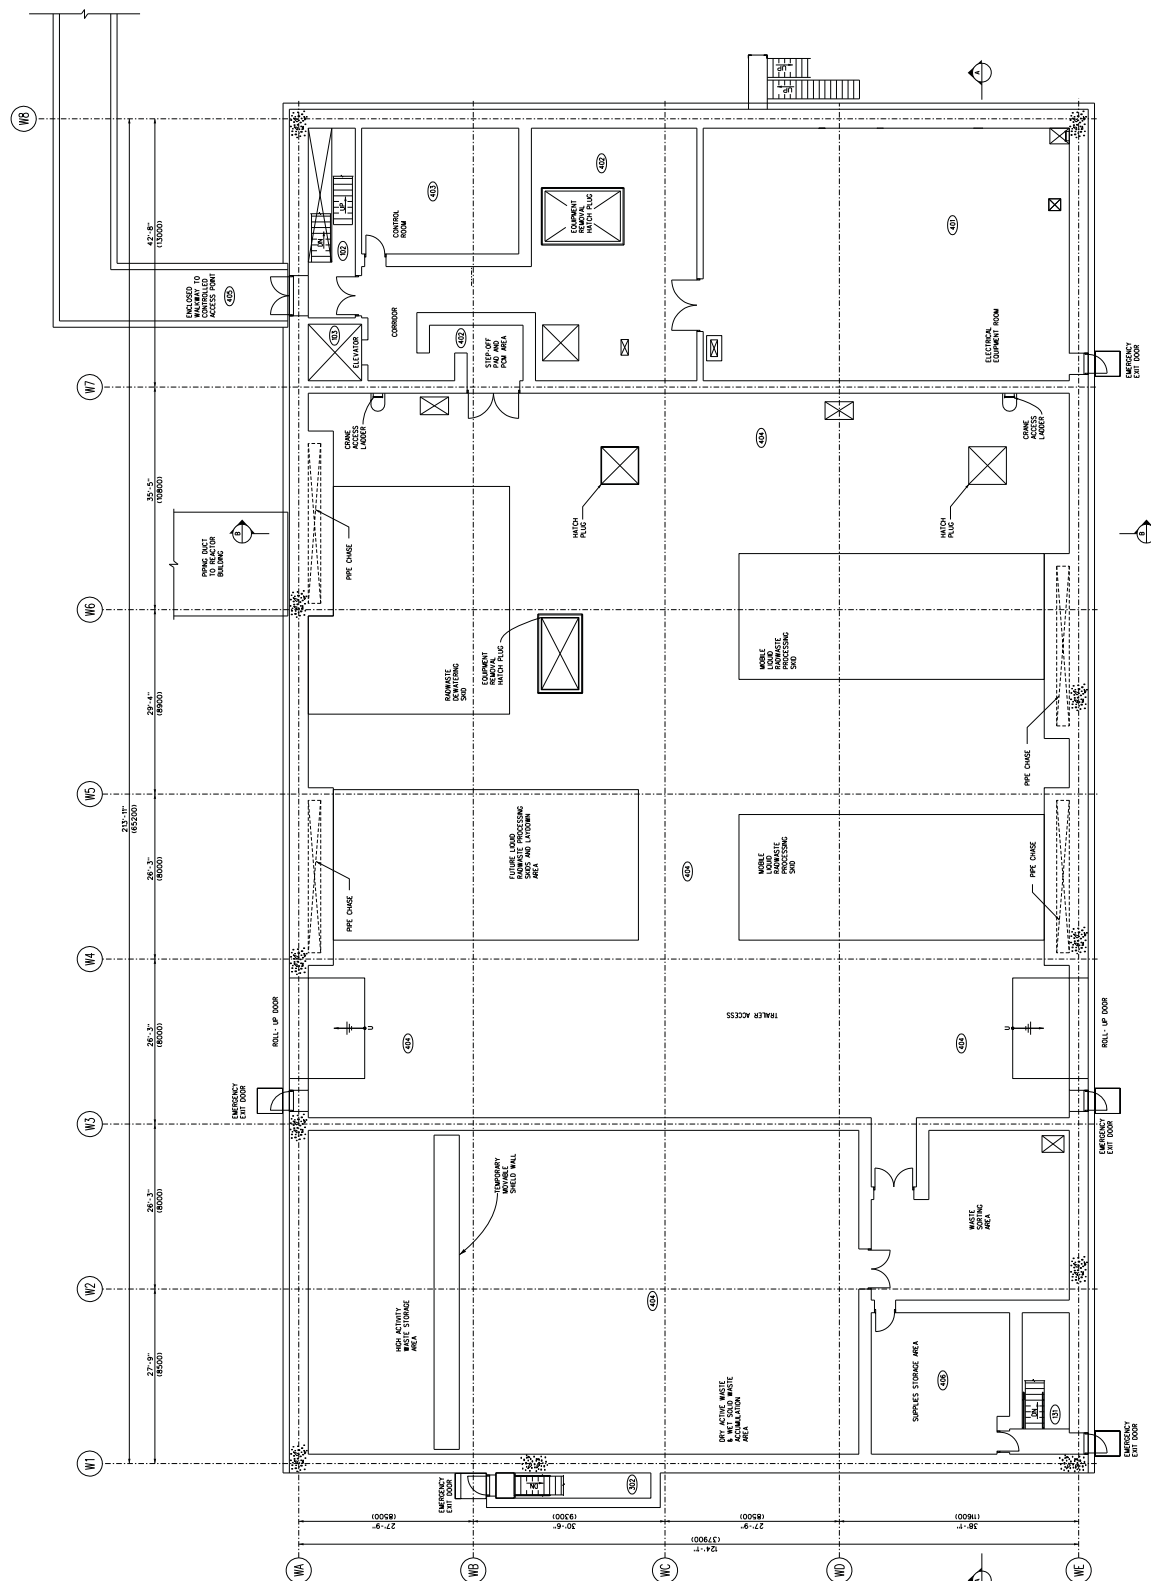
A RADWASTE BUILDING AT ELEVATION -1700 MM
